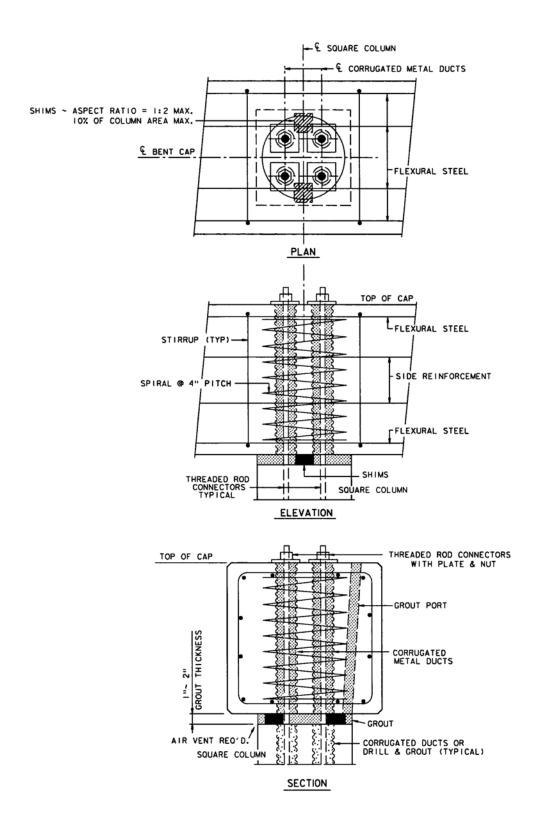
Grouted Vertical Duct on Pile (Embedded Option)
